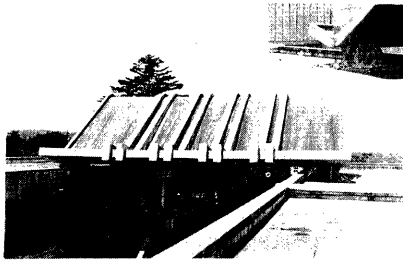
Damage of pent roof structure (Tohoku university).
